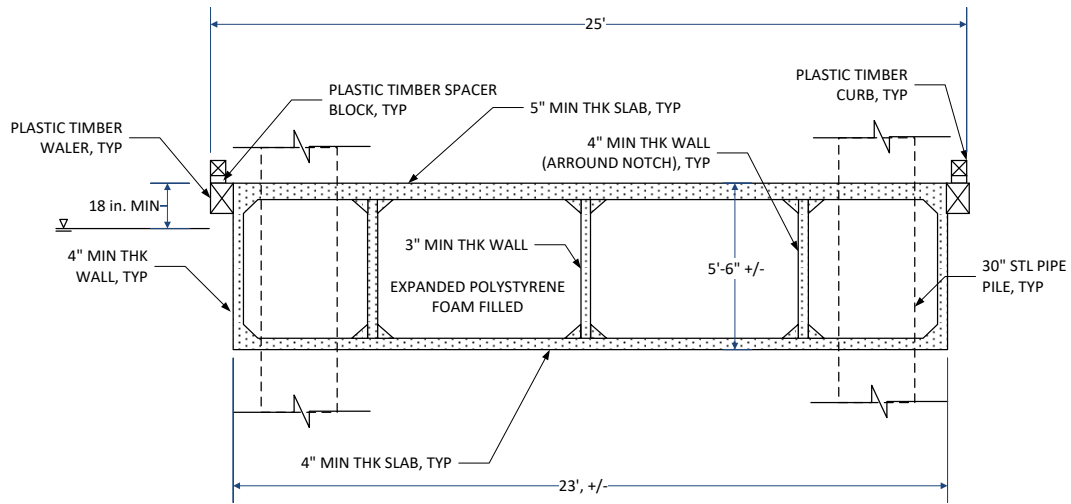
Typical Interstitial Guide Pile Moored Float Cross-Section for 20 and 25' Wide Floats
